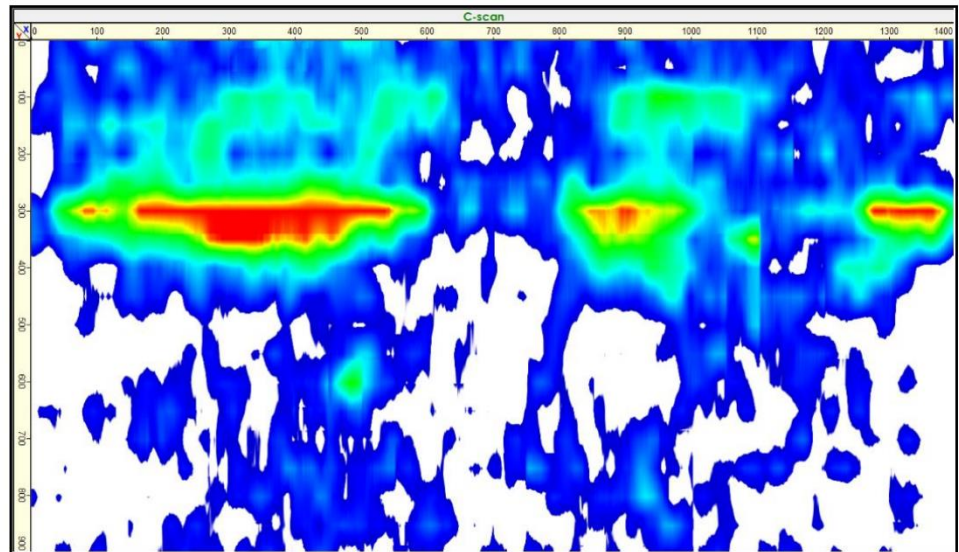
(b). Second horizontal layer of reinforcement, C scan.
